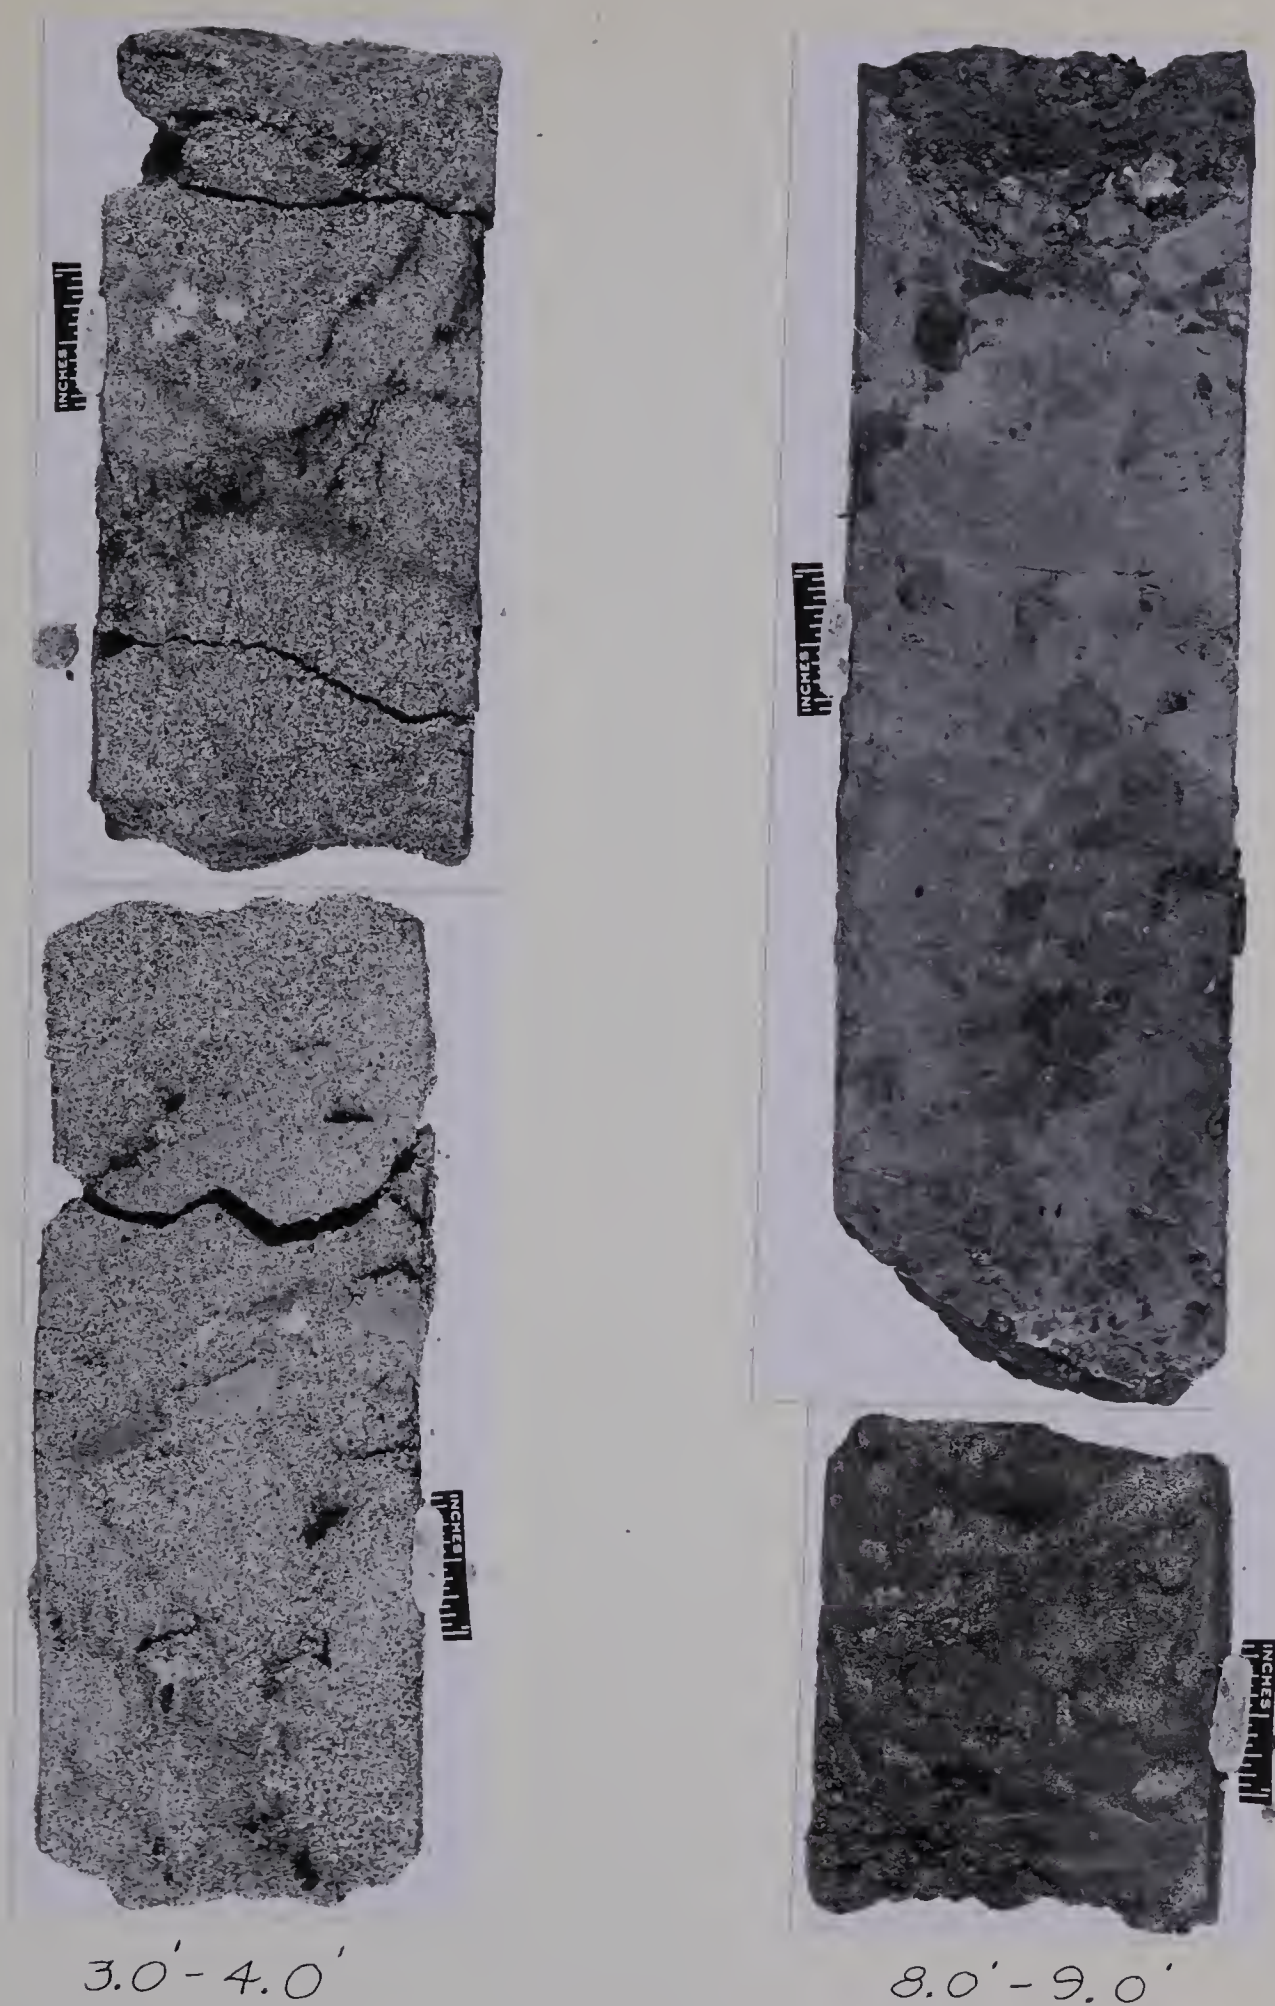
Auger hole C-2; axially cut shelby tube samples.
